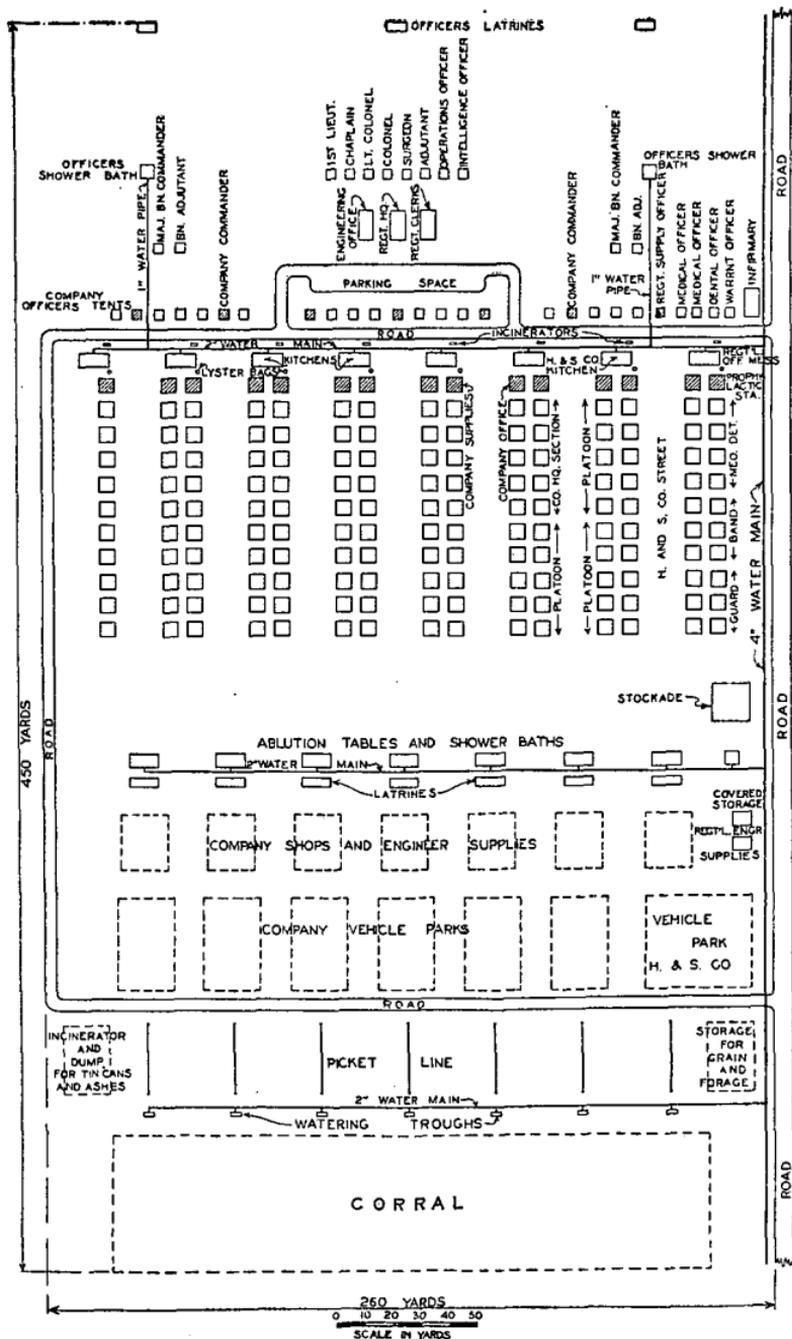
Camp layout for the general service regiment while engaged in general construction
